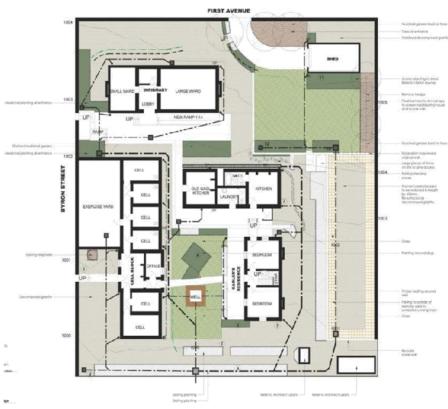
Somewhere Landscape Architects - Site Layout / Landscape Masterplan Drawing.
